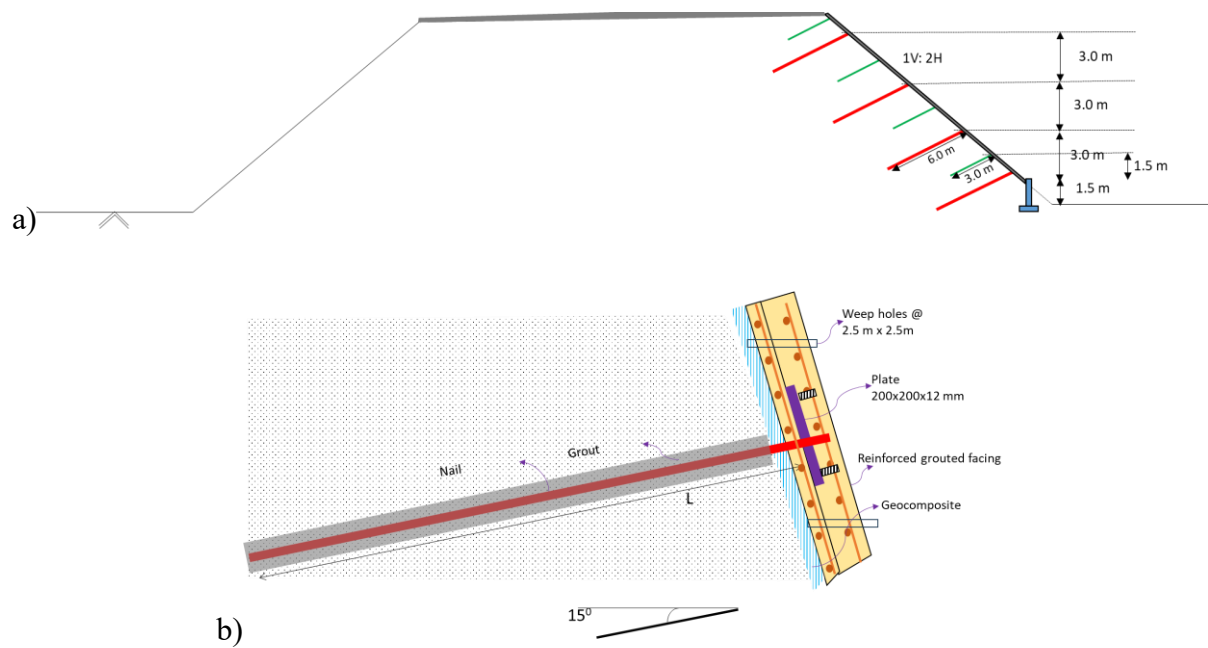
Sectional view of nailing configuration (Adjust configuration as per height)
